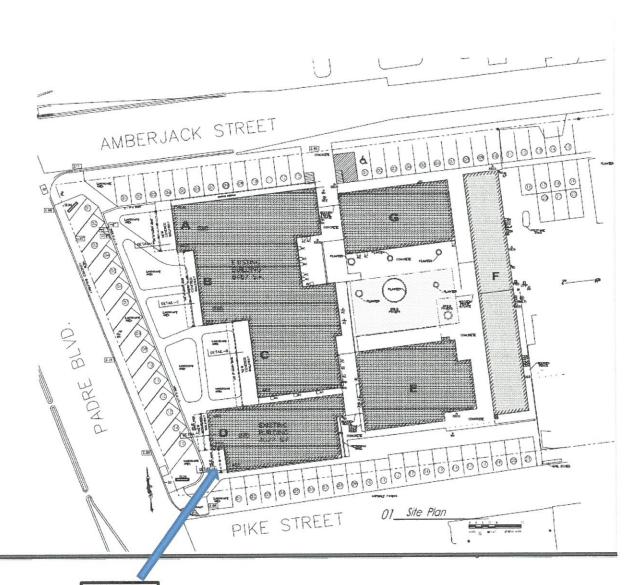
EXHIBIT B SITE PLAN OF THE SHOPPING CENTER
